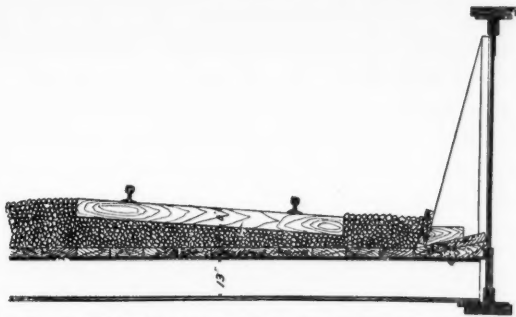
SOUTHERN CALIFORNIA RY. METHOD OF WATER-PROOFING BRIDGE FLOORS.
